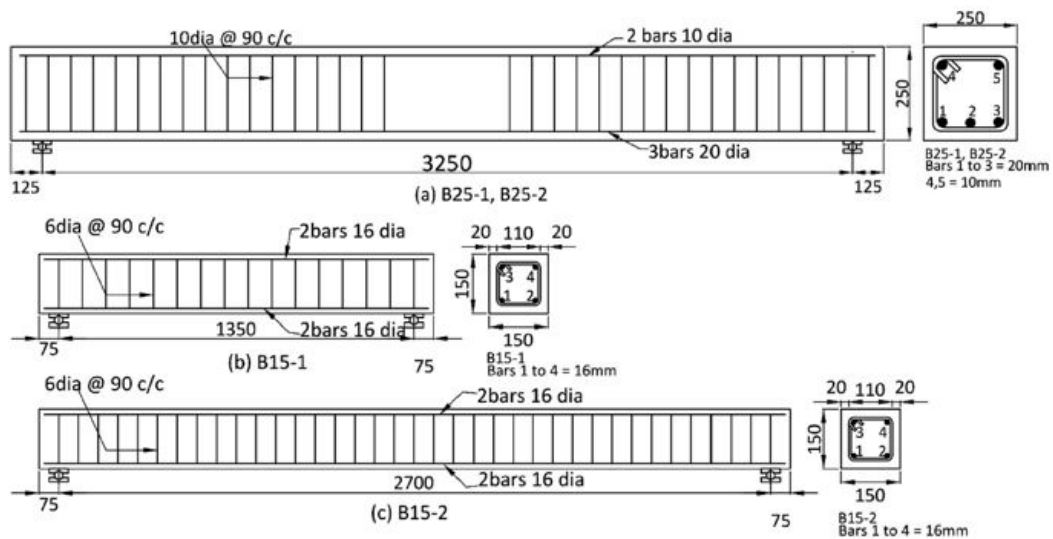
Cross sections and reinforcement configuration for beams tested by Singh et al. (2017).
